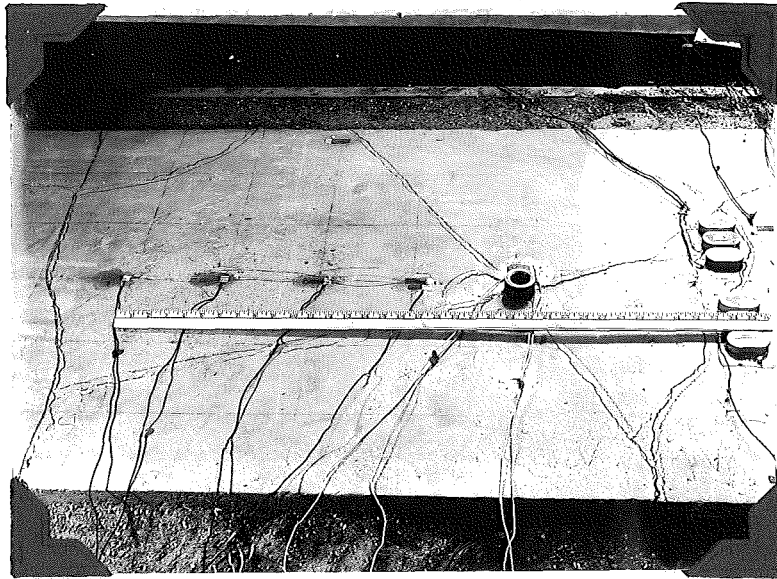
Radial and transverse cracks in center of slab caused by load on 1-3/4 in. plate. There was apparently some shear failure at the point of load.
